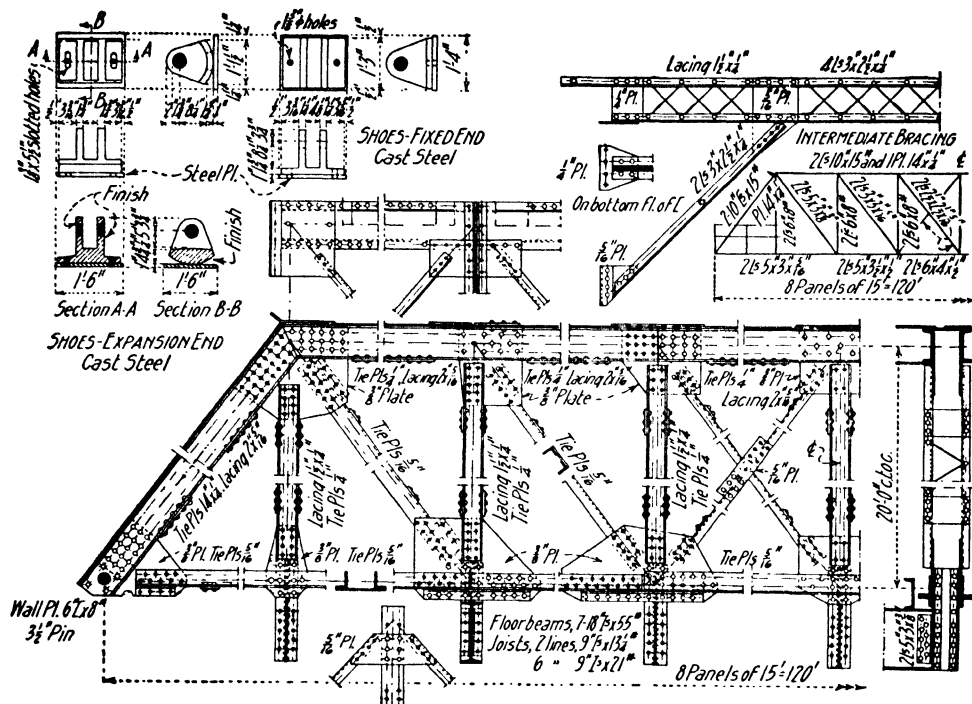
DETAIL PLANS OF THROUGH HIGH TRUSS SPAN. WISCONSIN HIGHWAY COMMISSION.
